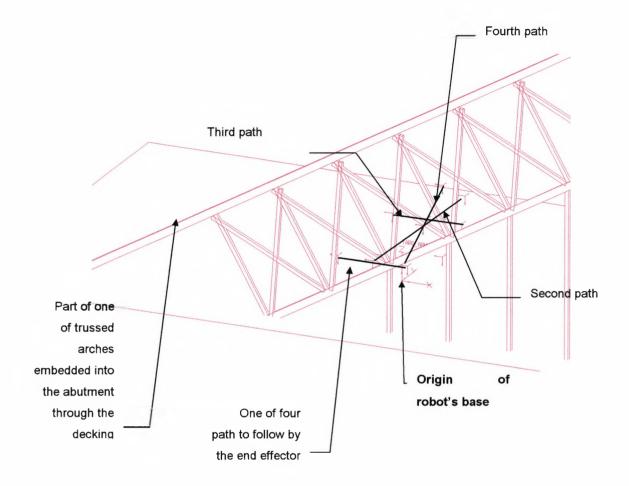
Bridge Detail [D3] according to Table 4.3
